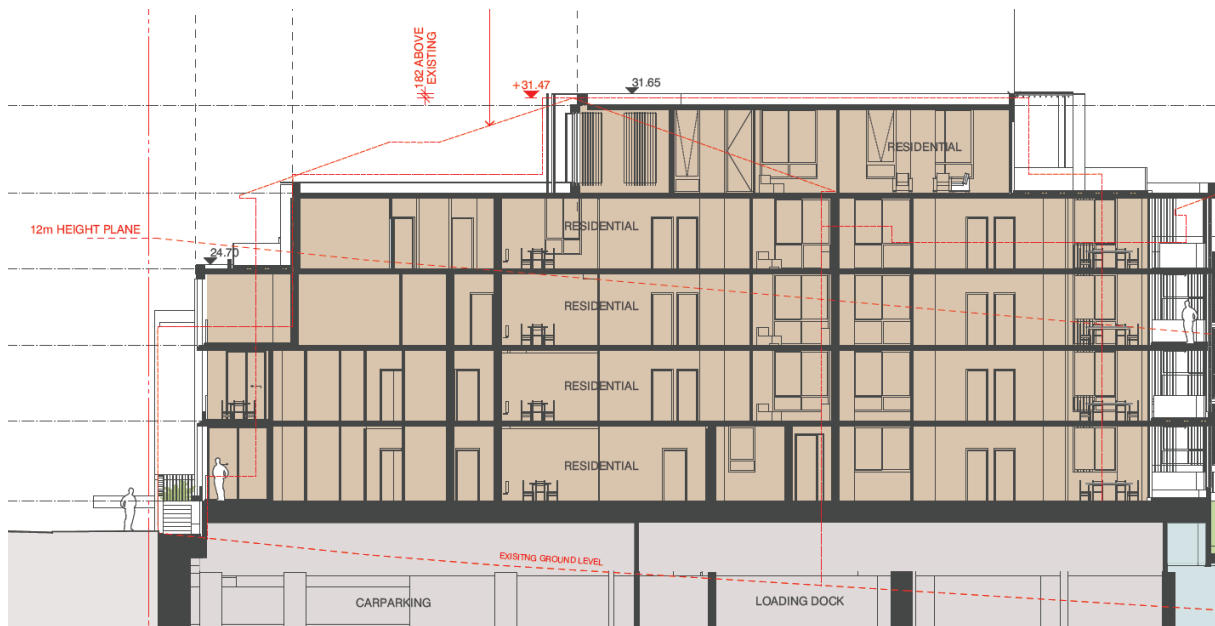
Excerpt from Section AA with outline of existing Boutique Hotel and 12.0m building height line (prepared by Fender Katsalidis)
